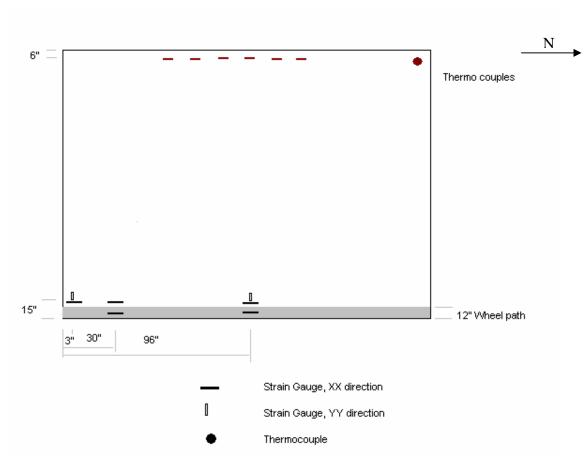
Instrumentation layout for Test Slabs 1G, 2C, 2E and 2G
